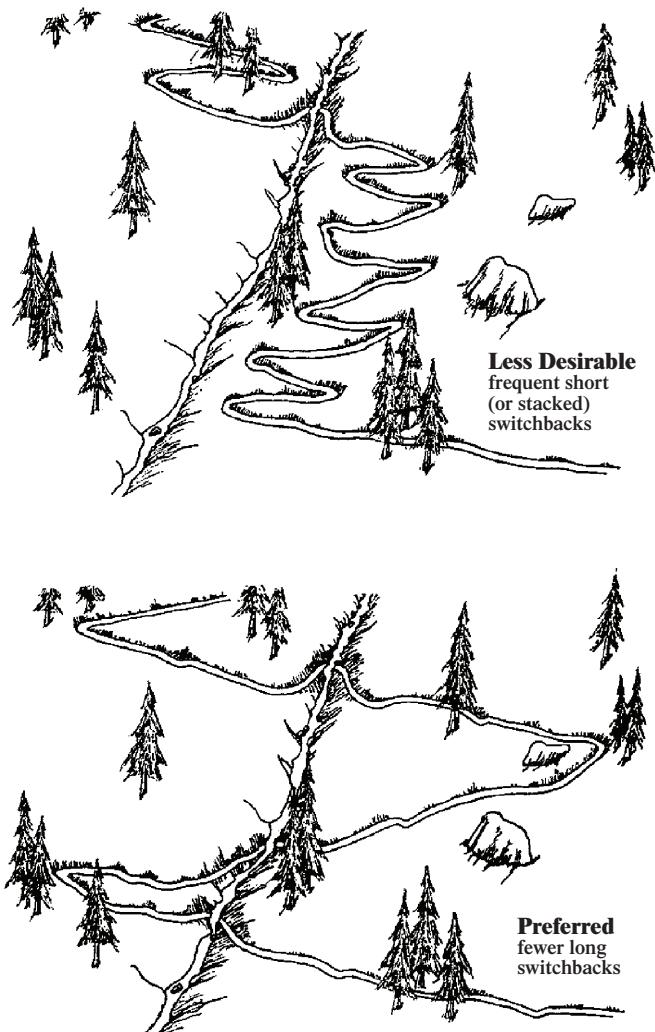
Long sections of trail between switchbacks are usually better than short sections—fewer switchbacks will be needed, with fewer turns to shortcut.
